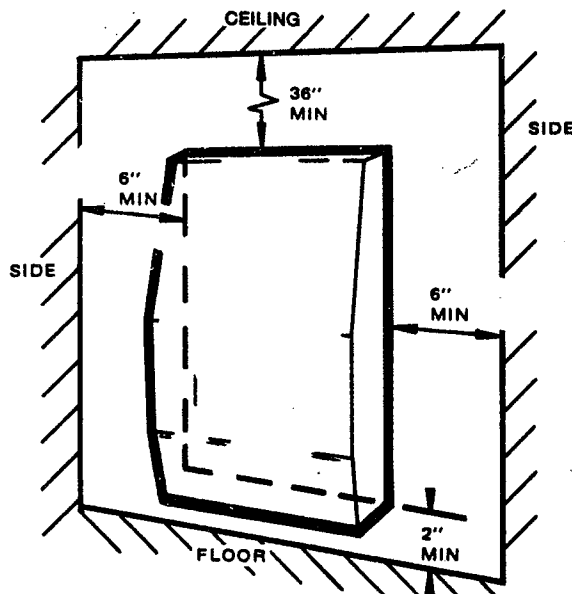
MINIMUM CLEARANCES—COMBUSTIBLE SURFACES
